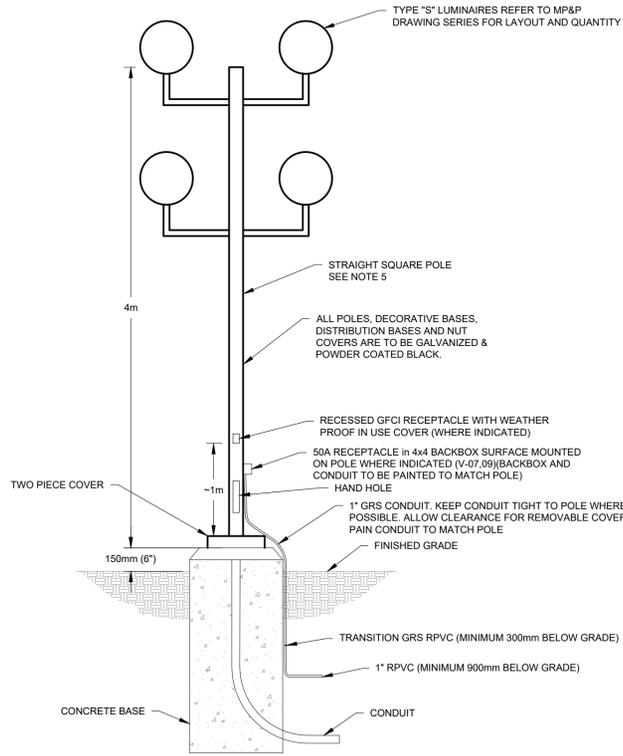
RECEPTACLE PARKING LOT - POST MOUNTING DETAIL
